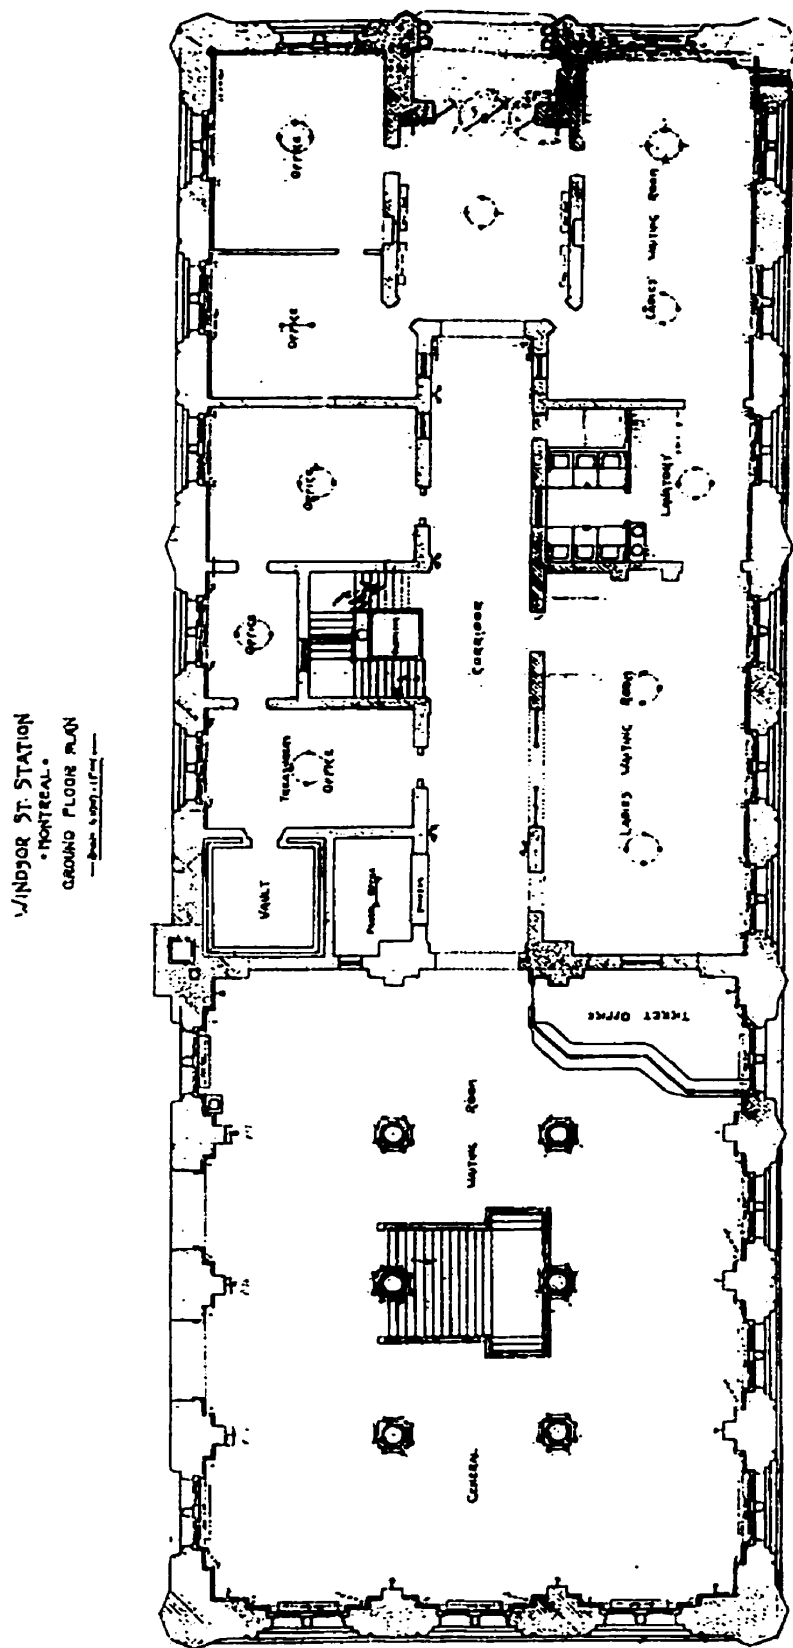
Ground floor plan, Windsor Station, showing general and ladies' waiting rooms. Source: CPA.
